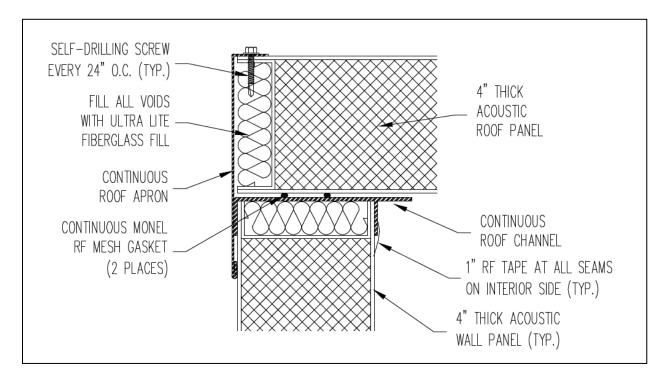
Fabrication details: top of wall. (Adapted from Noise Barriers, LLC, 2011.)
